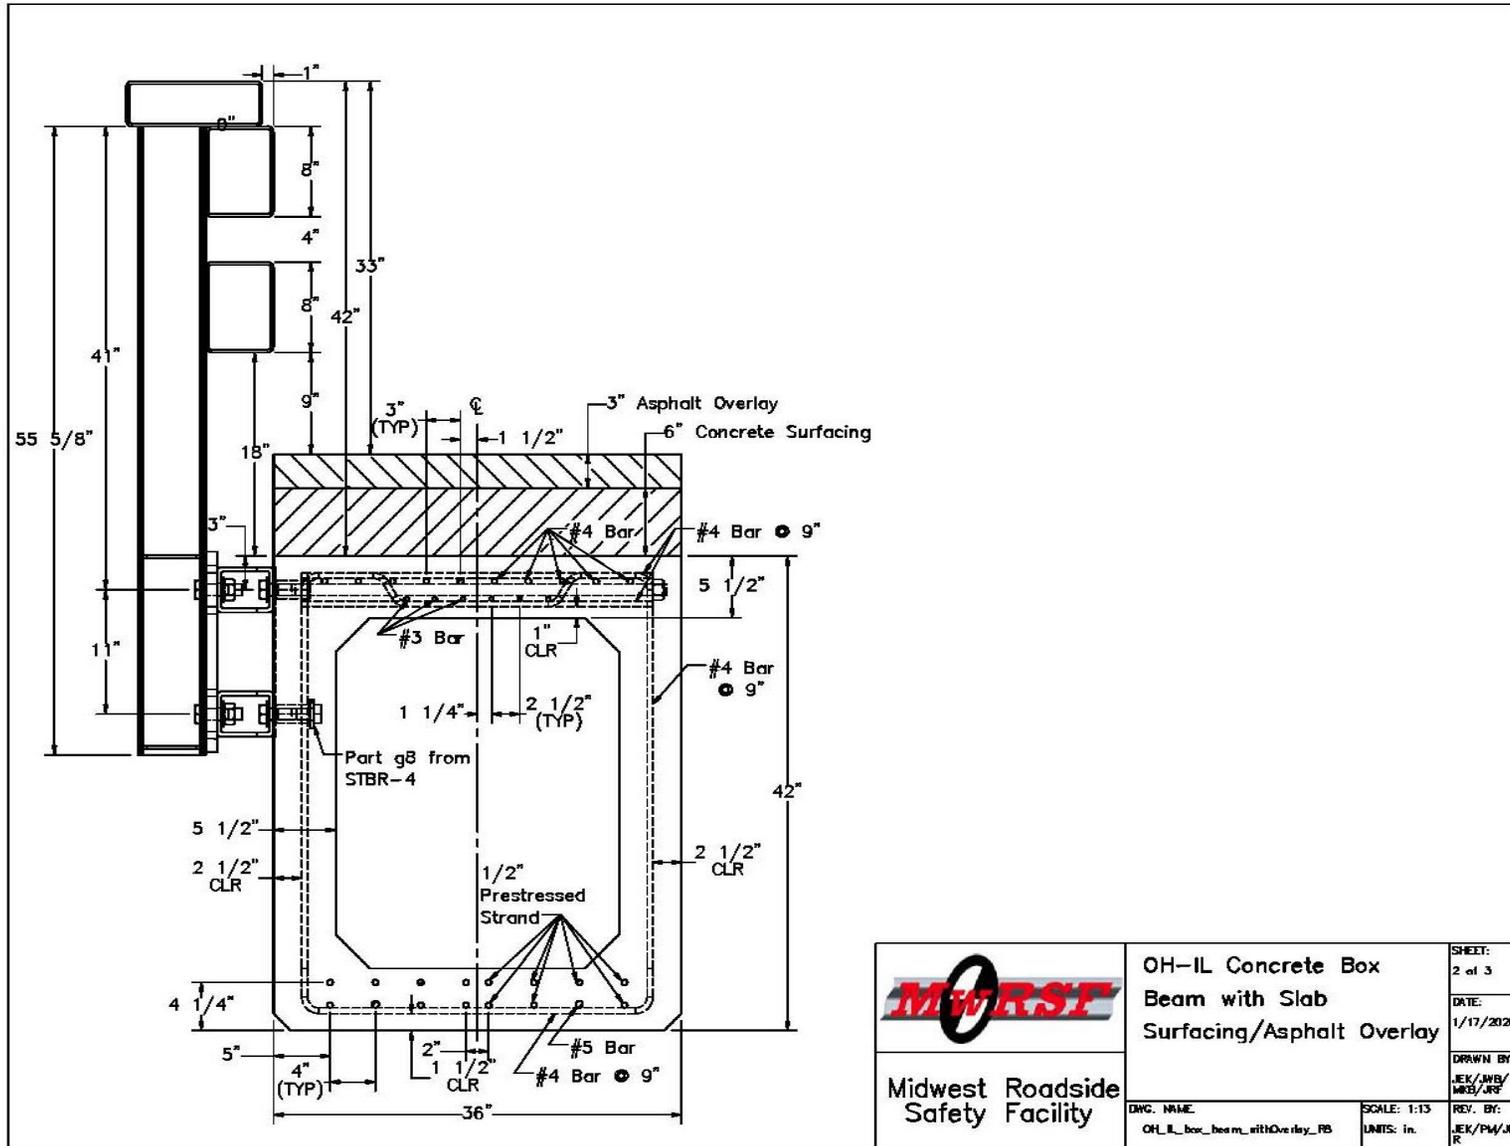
Typical 42-in. (1067-mm) Deep Concrete Box-Beam Girder with Concrete Wearing Surface and Future Overlay
